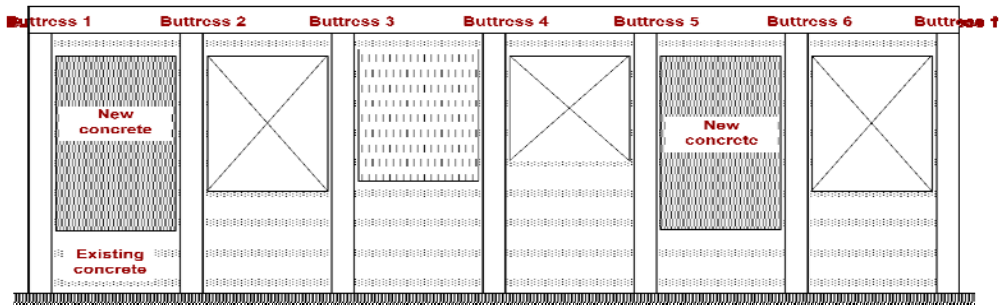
Elevation View of 3 Bay Opening Case (unfolded)
